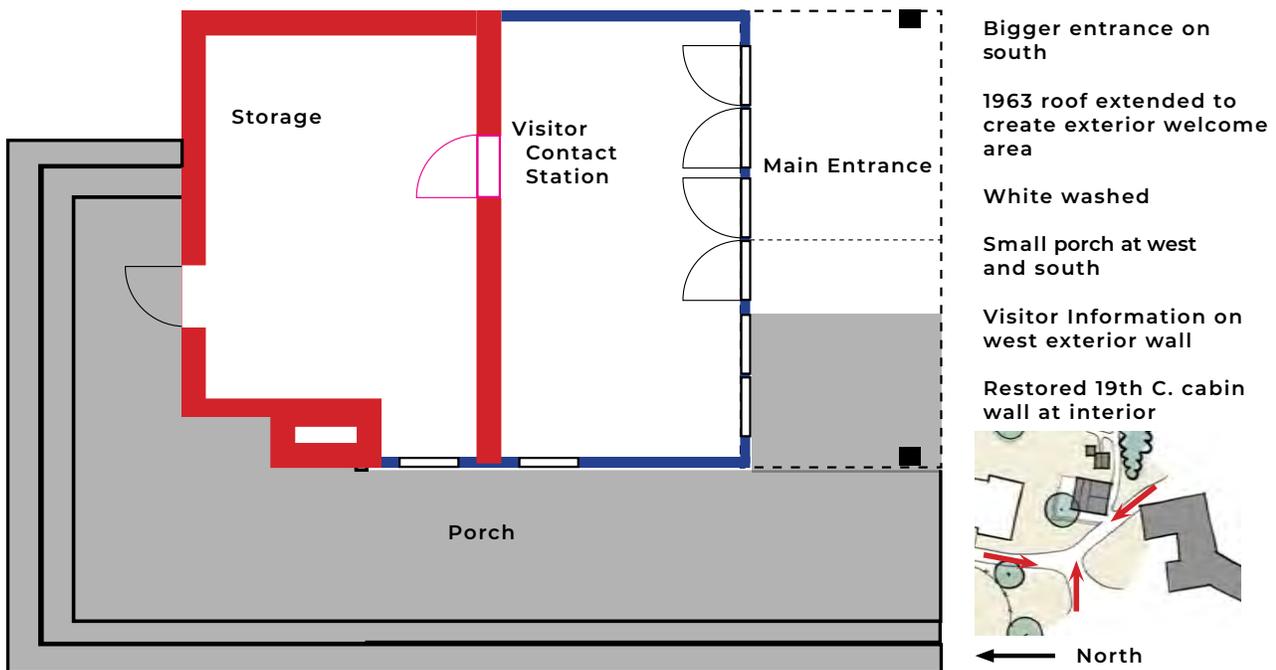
Proposed Cabin floor plan to transform it into a Visitor Contact Station.
